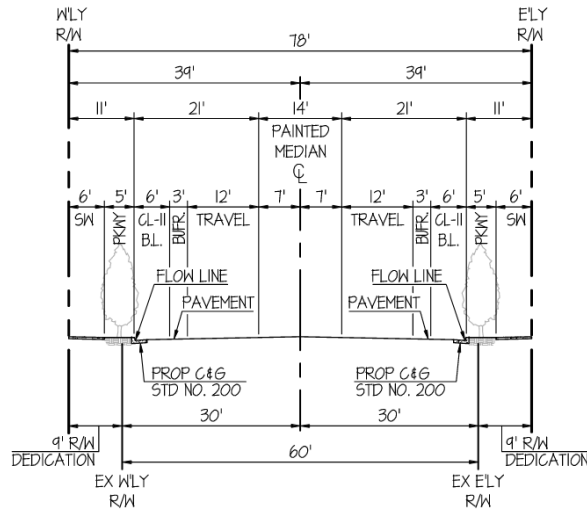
, Standard Street Sections – Secondary Arterial (Indian Avenue)
